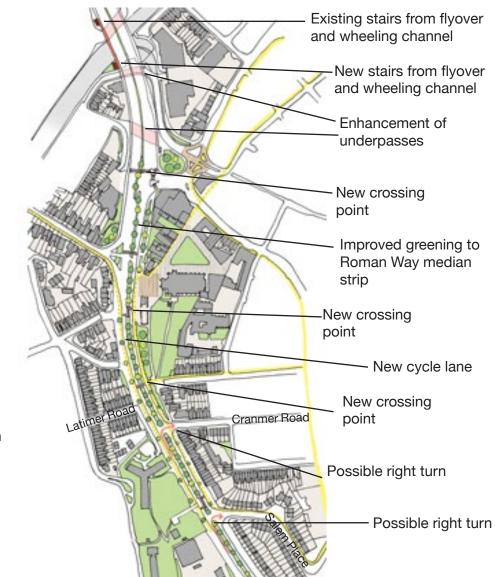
Indicative sketch of potential Roman Way remodelling. The yellow illustrates cycle lanes (See section 3.4) The pink on the plan show where underpasses should be improved.
